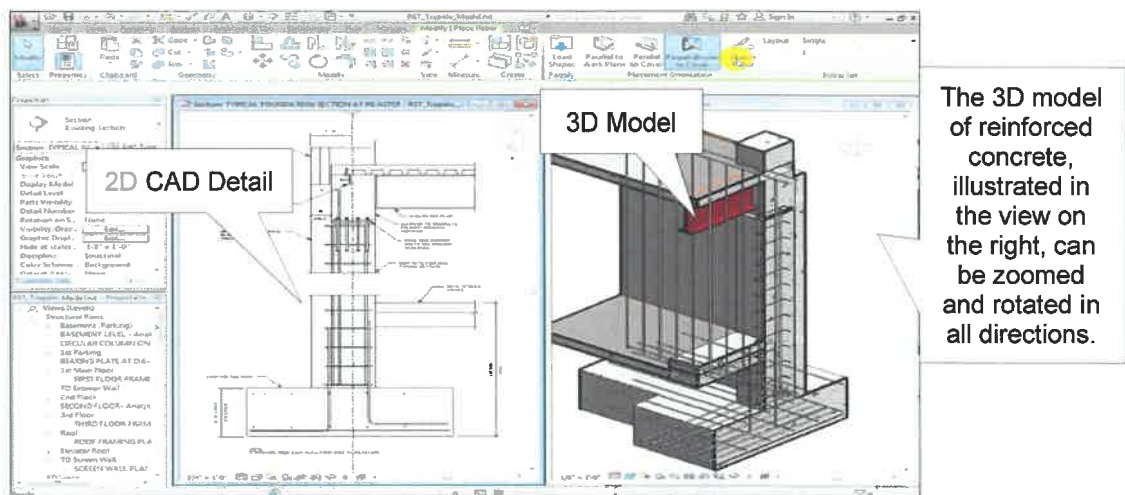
3D BIM Visualisation (Image Courtesy of Autodesk Revit Structure)
